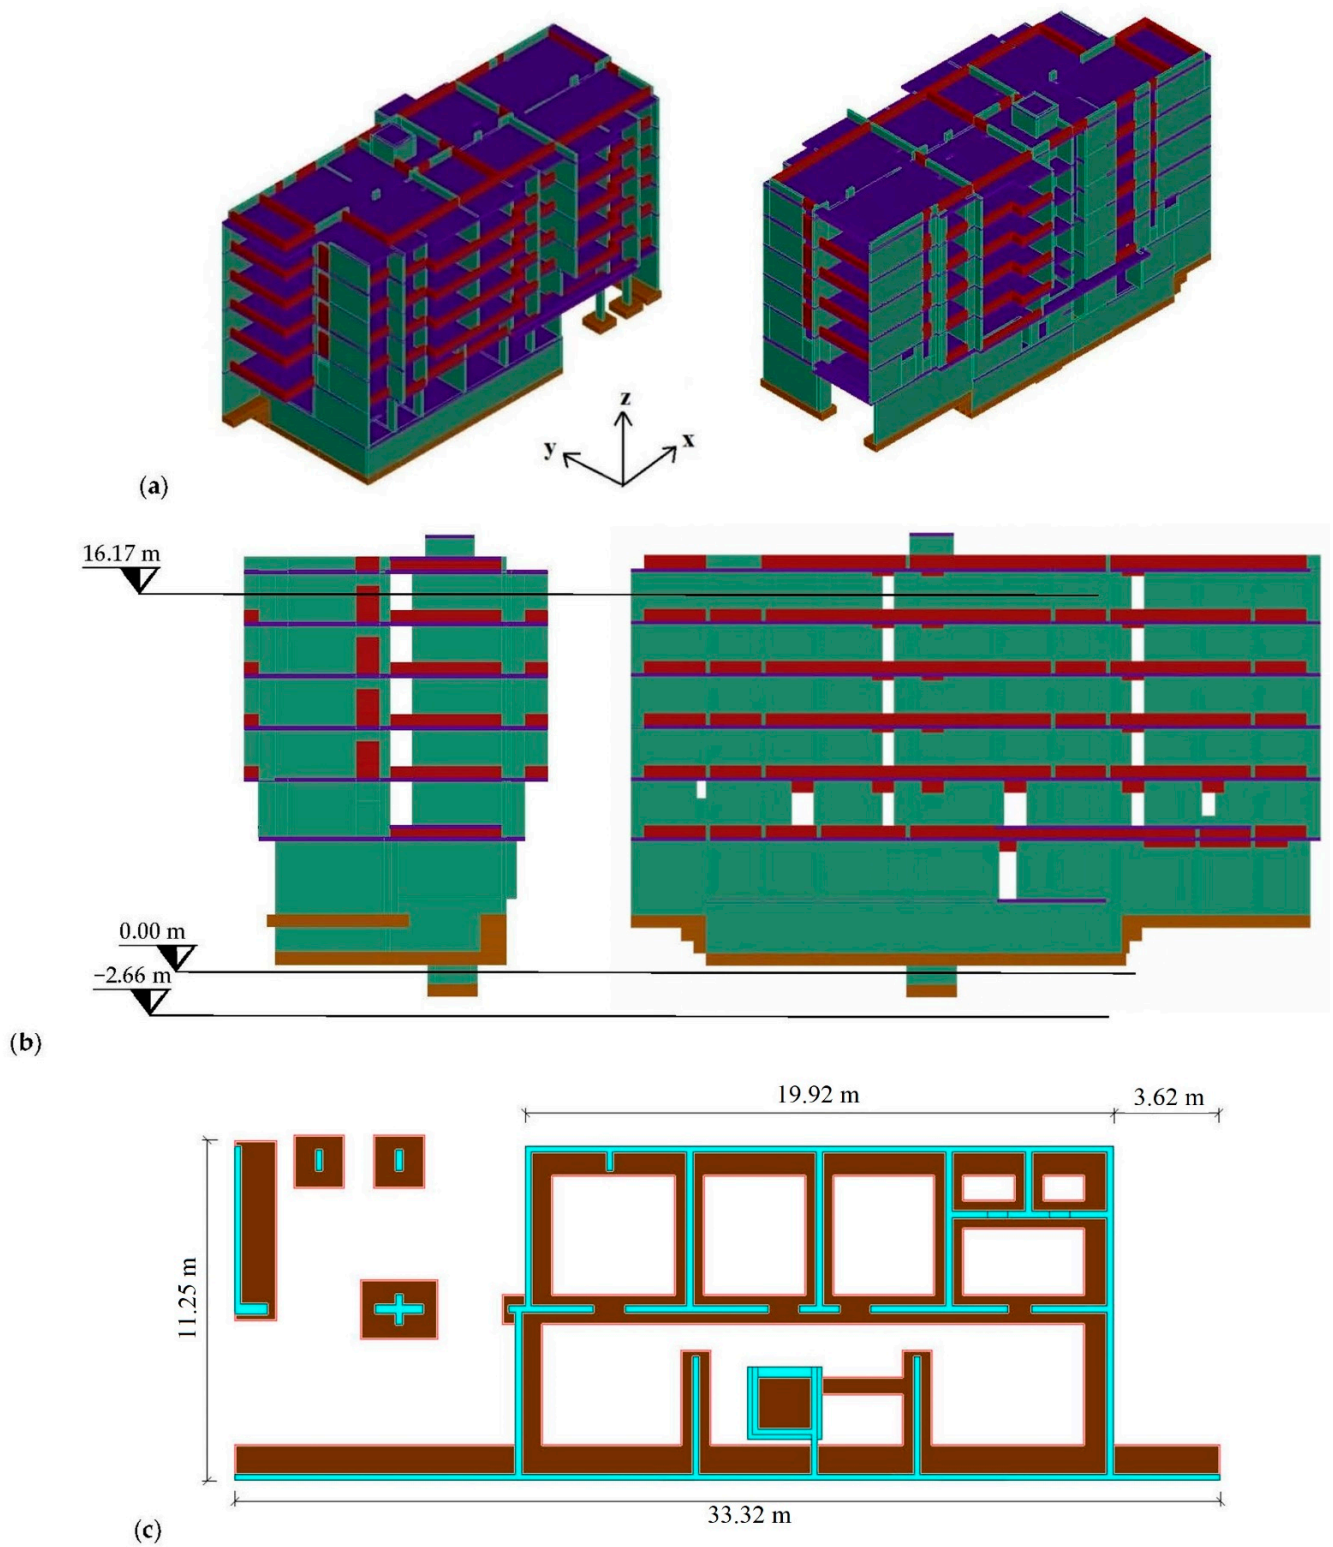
Overall views with the different structural components: (a) 3D rendering views; (b) elevation sections, and (c) plan of the building. Shear walls and upturned beams are colored in green and red, respectively.
